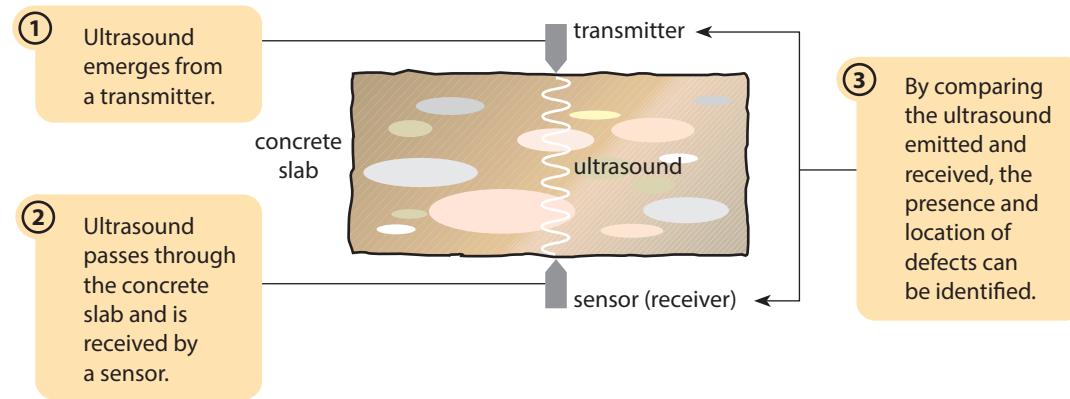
Inspecting a concrete slab using ultrasound
